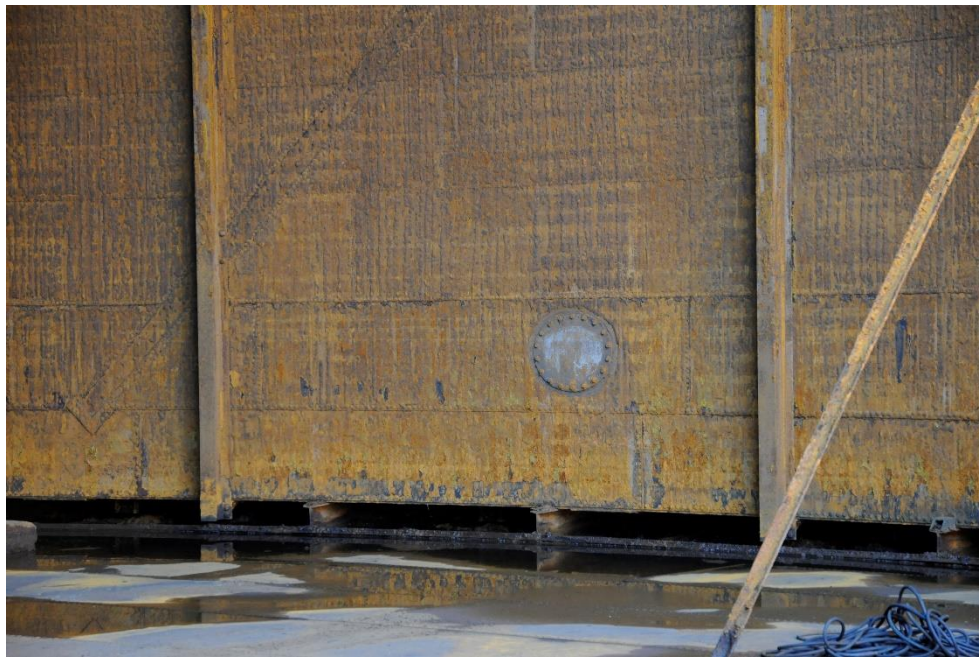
View of the tank sides with vertical stiffeners, rest blocks and manhole access.
